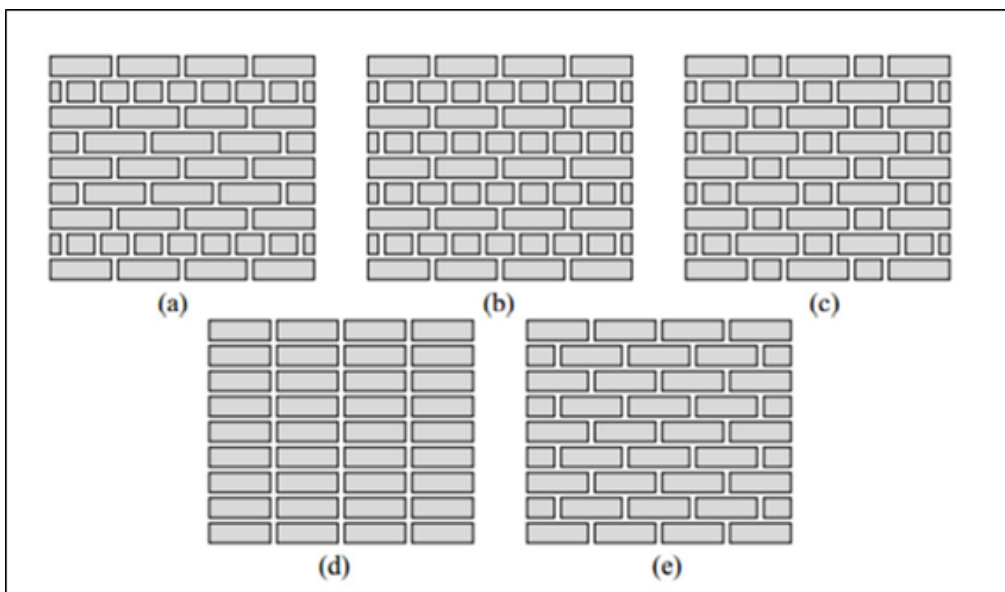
Masonry brick walls a) simple or American b) cross or English c) filament d) straight e) staggered (Lourenço, 1998; Demirkan, 2014).
